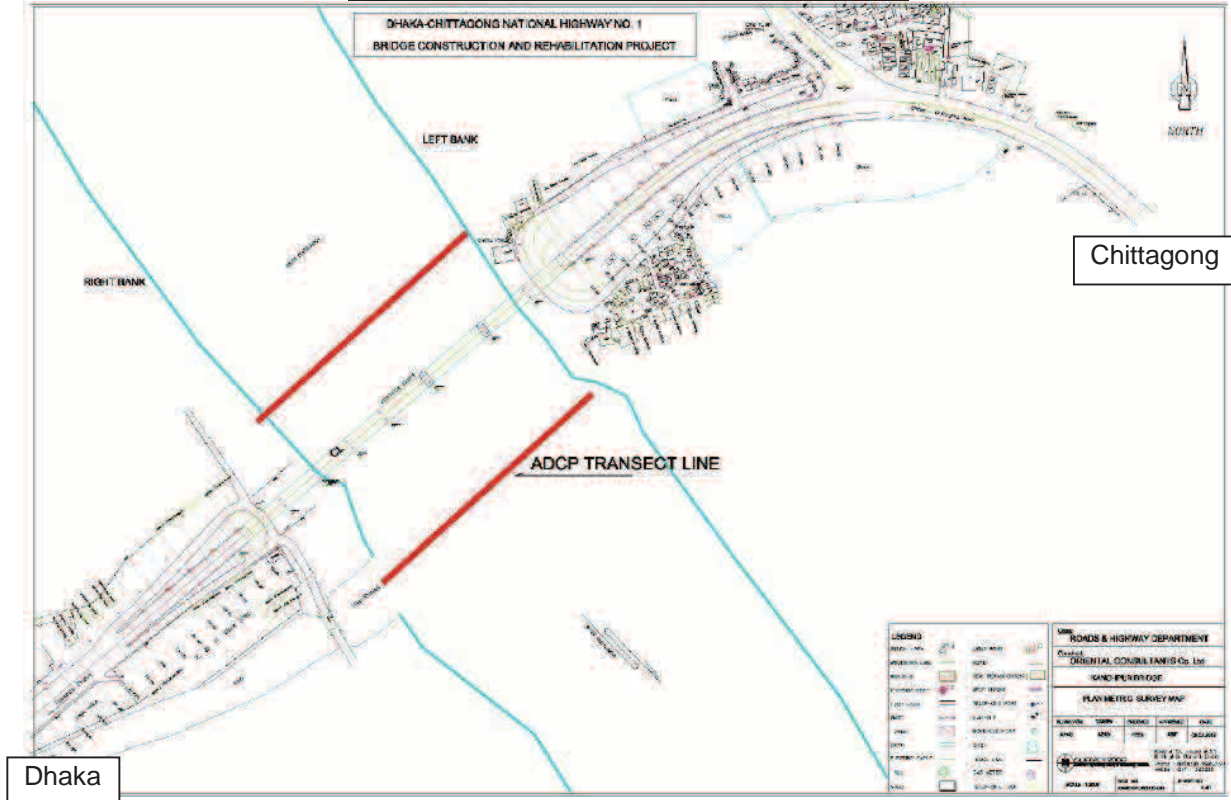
Transect Lines at Kanchpur Bridge Site
